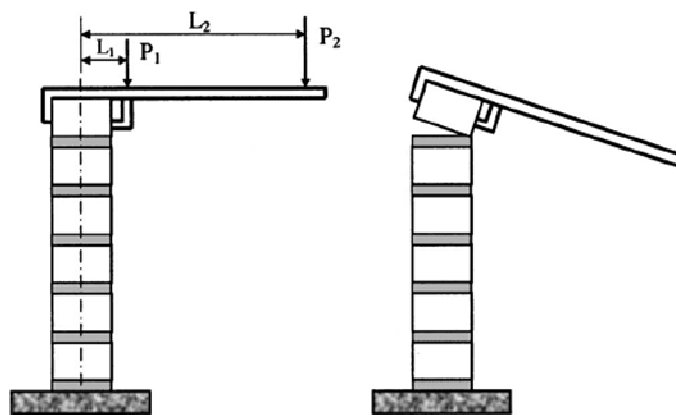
Bond wrench shown in position before test and after bond failure (ASTM C1072)
